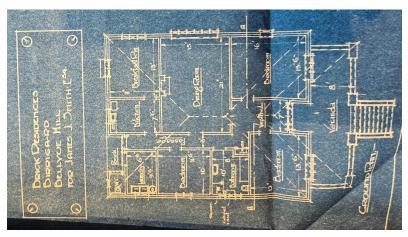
Blueprint showing the internal layout for both houses. (Woollahra Council, BA24-456)
